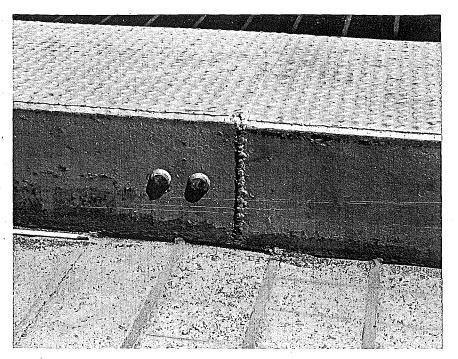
Median curb showing welds on transverse steel and gap along bottom between curb and deck.
